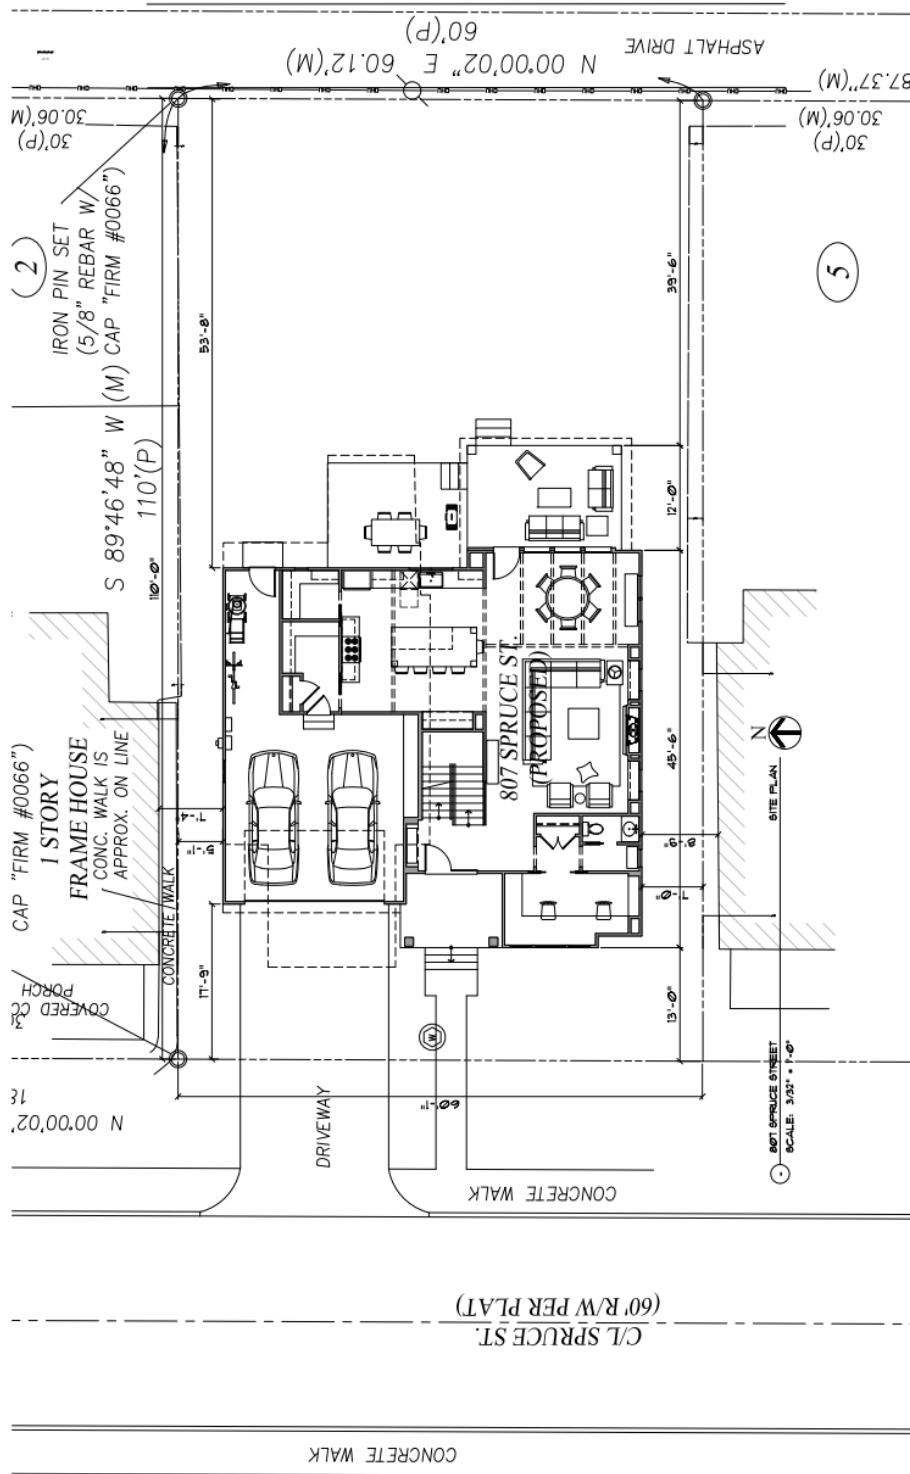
Site plan of the proposed single-family dwelling for this variance petition.
